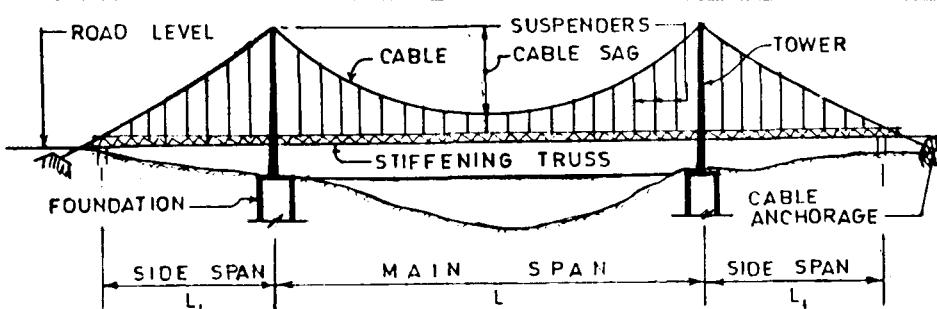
COMPONENTS OF A SUSPENSION BRIDGE
